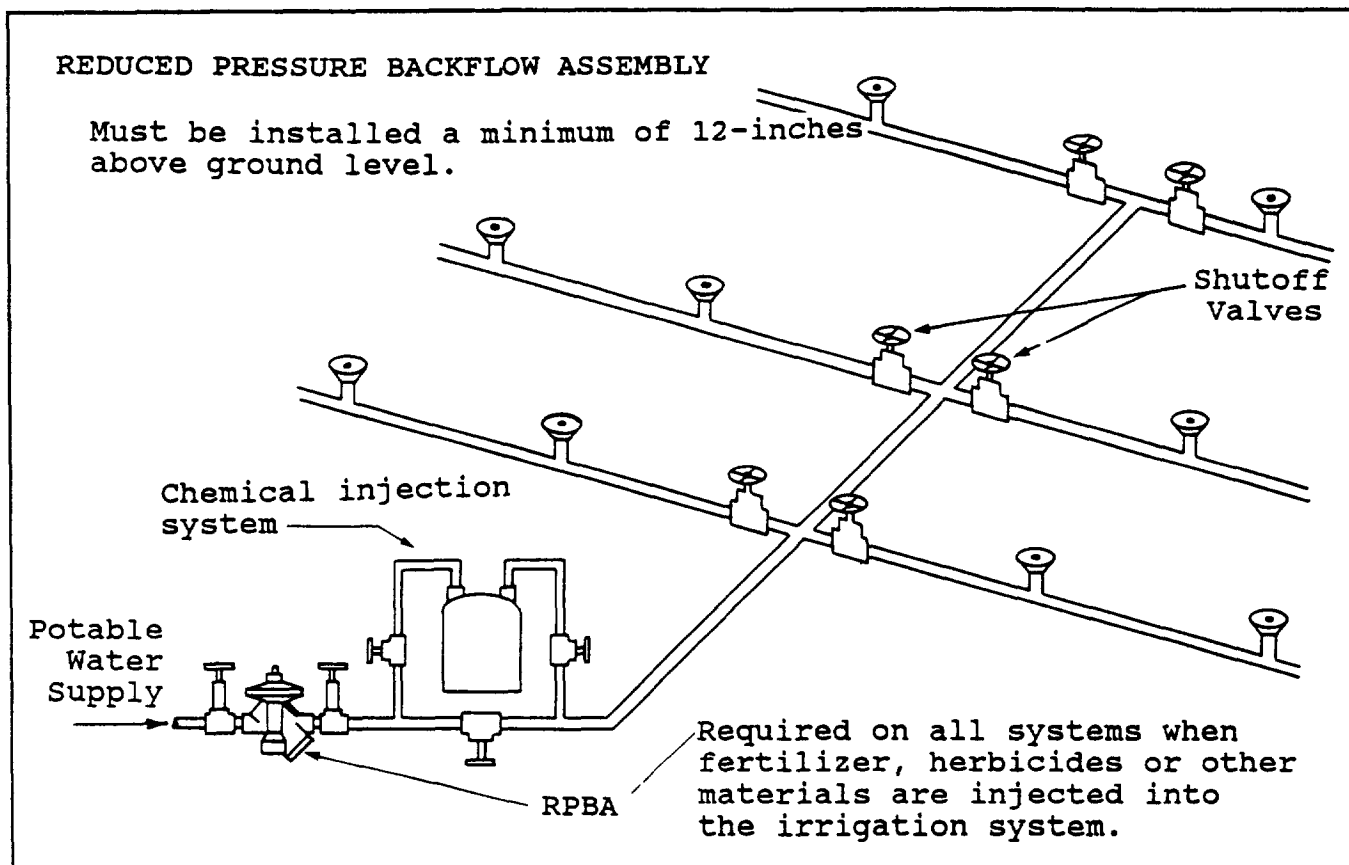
Hillside Irrigation System Using Reduced Pressure Backflow Assembly.
